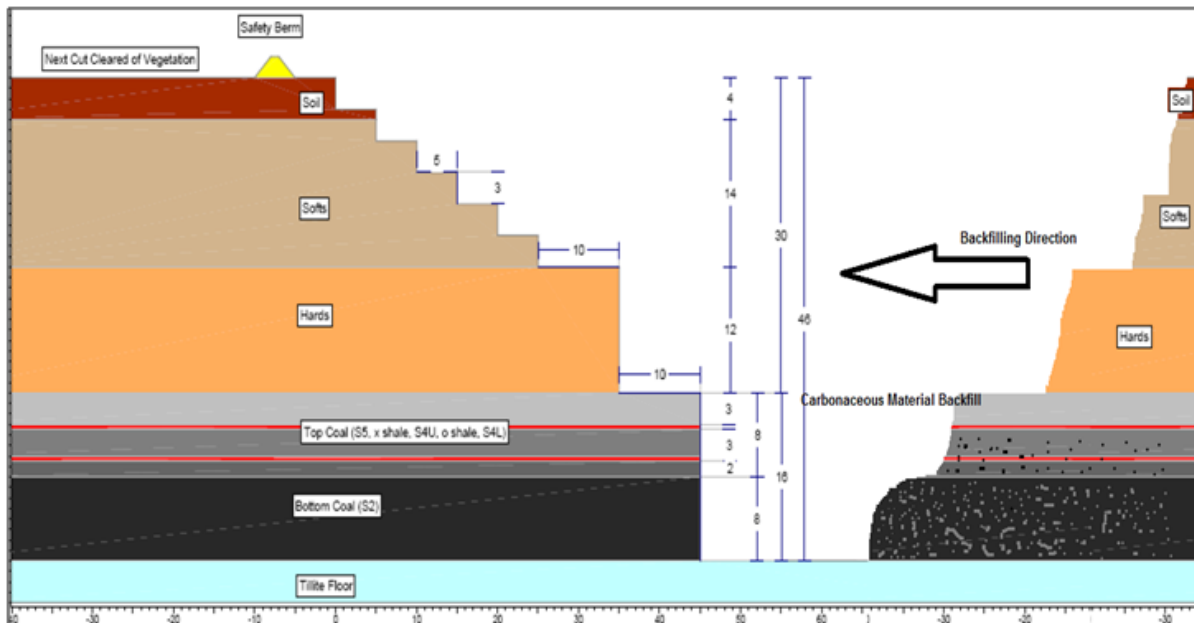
Open pit bench configurations and typical backfill sequence at LCM (SPI, 2014).
